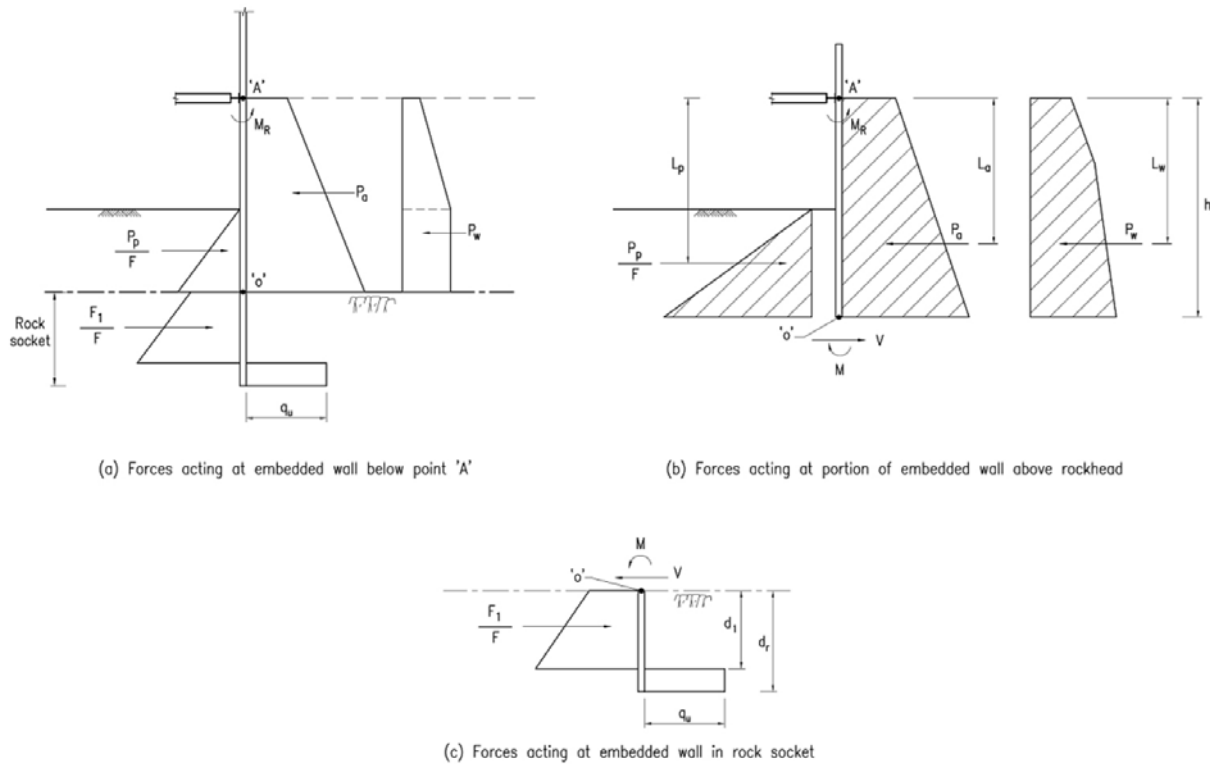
A suggested method for checking kickout failure of rock socketed embedded wall
